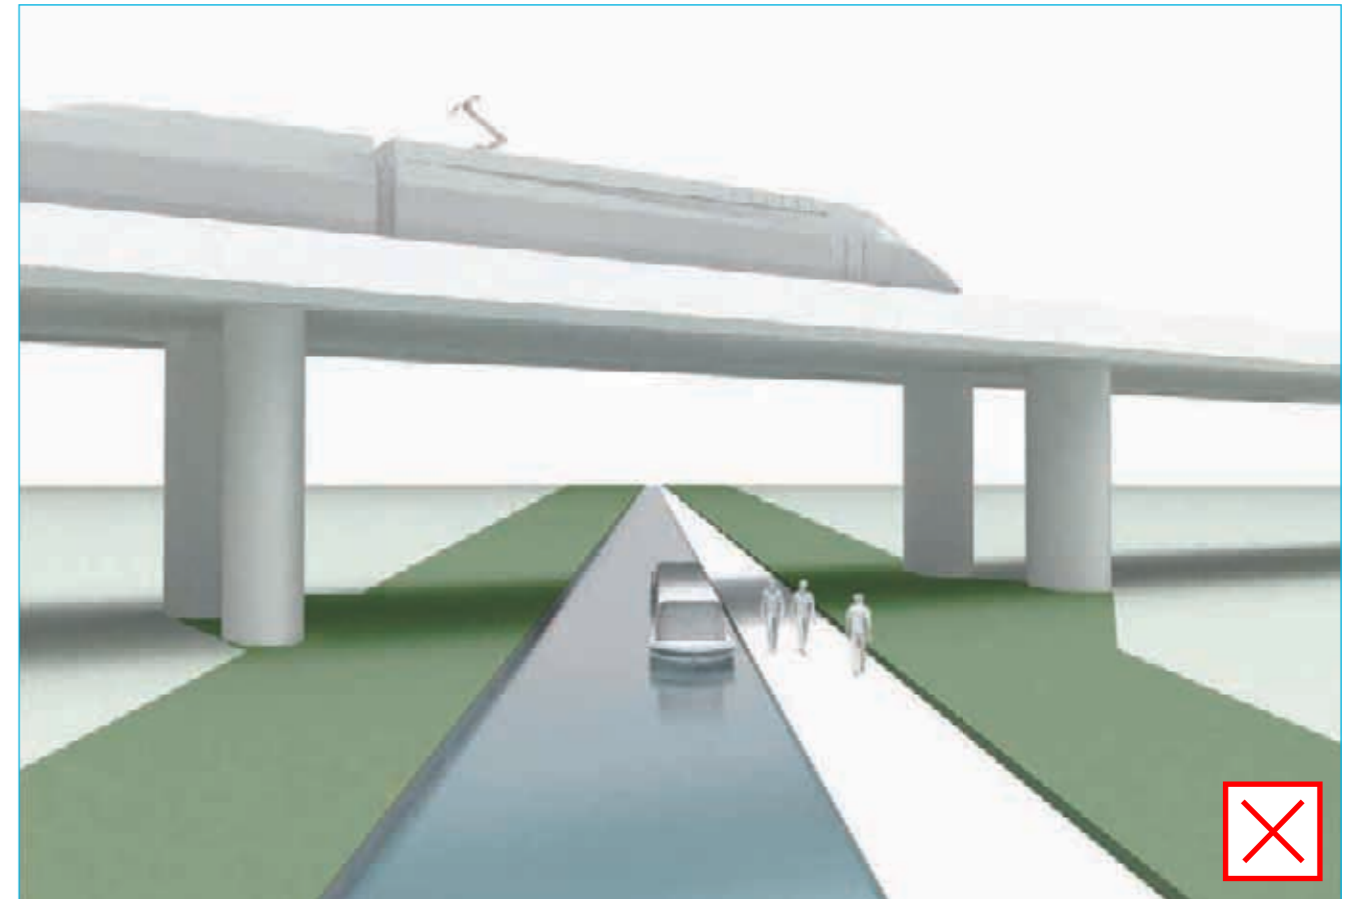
Piers aligned to the rail create 'dead' spaces for skewed crossings
